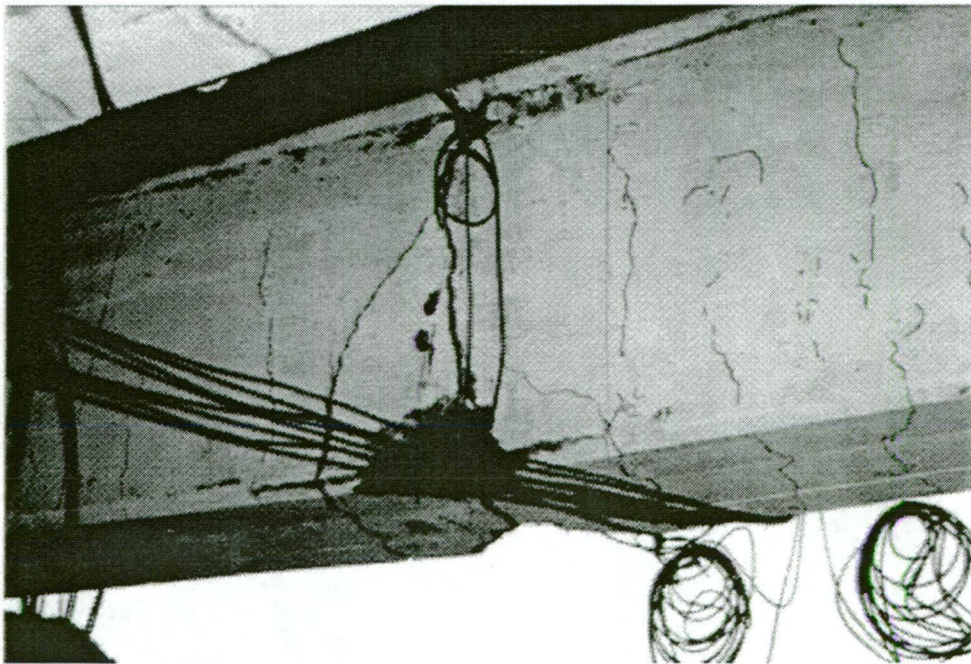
Cracking of Upstream Beam at Ultimate Load
